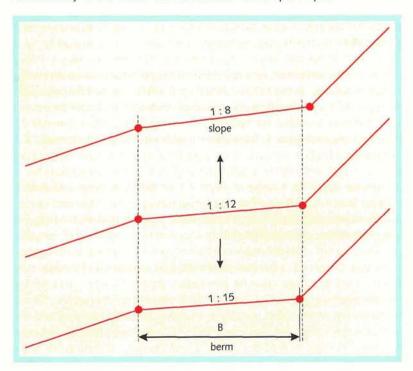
determination of slope and berm for slope section with slope between 1:8 and 1:15
